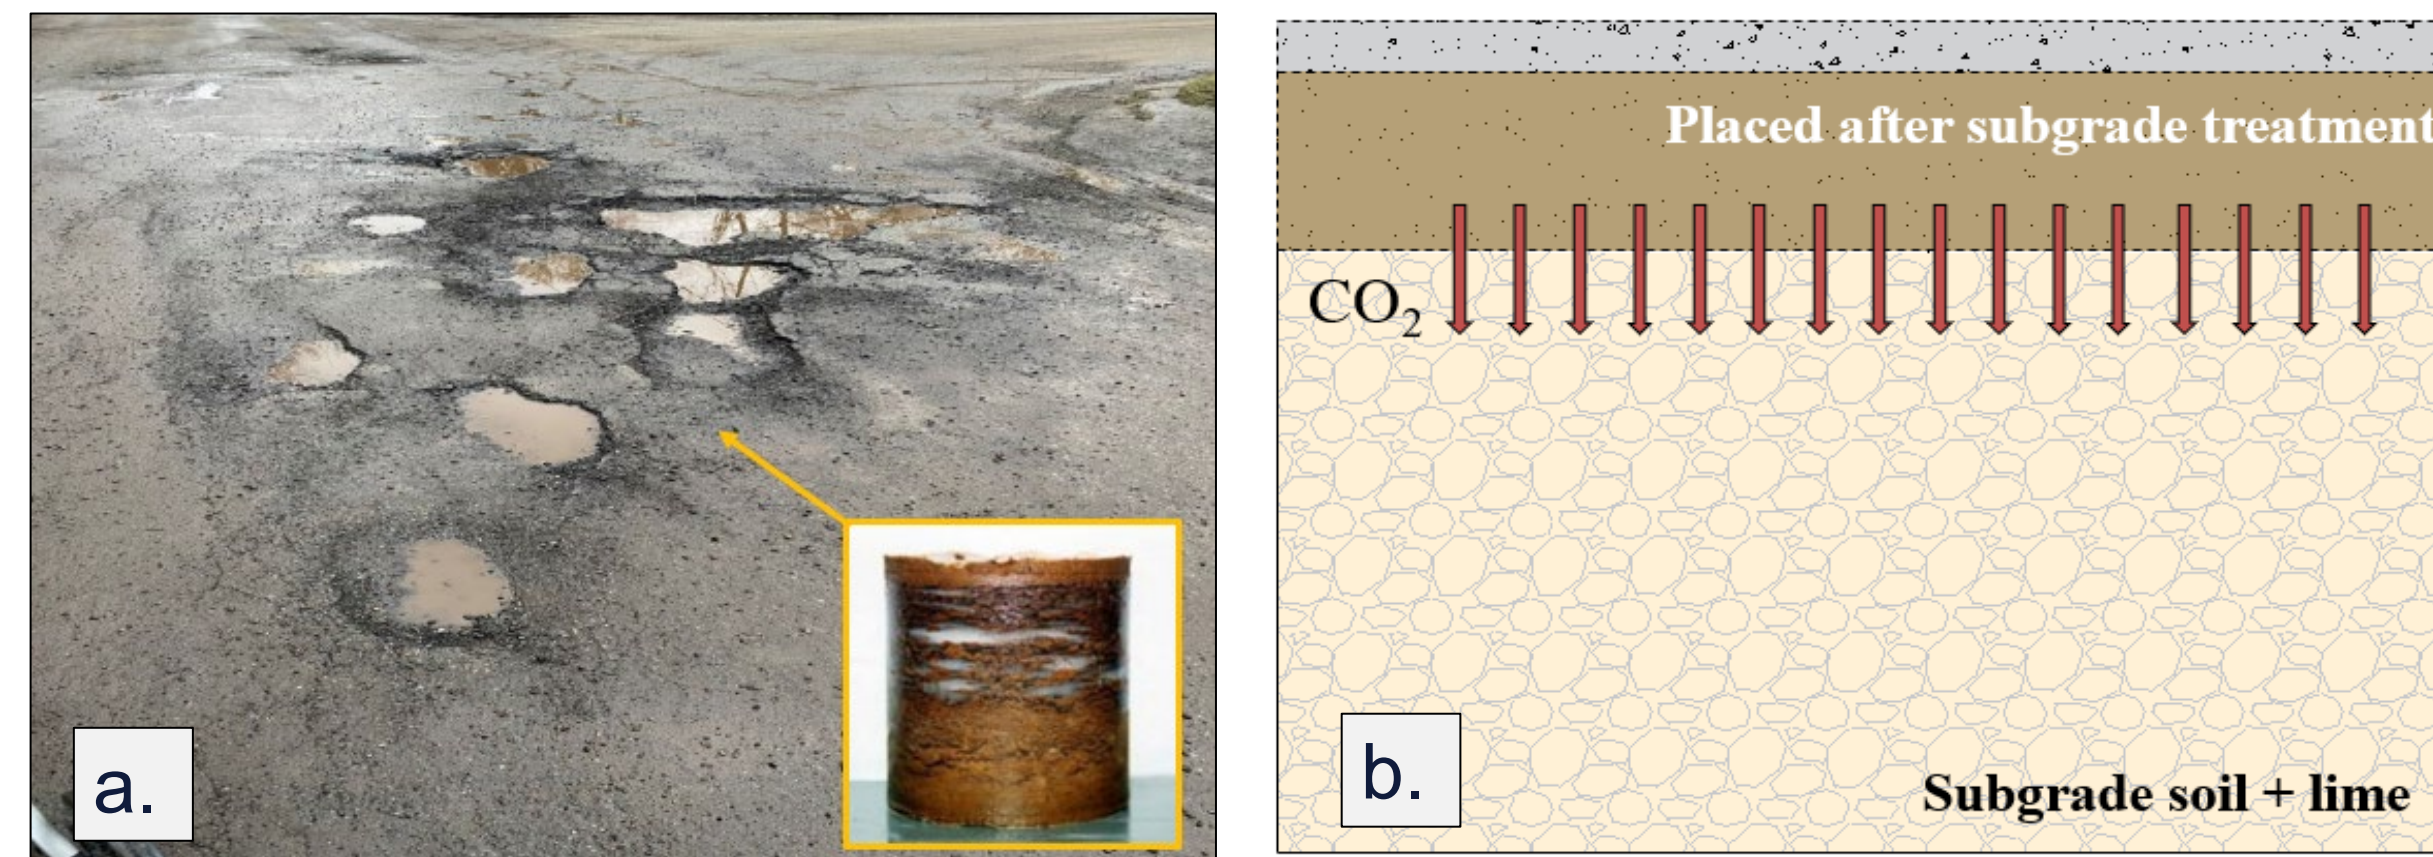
a. Pavement damage due to soil frosting.
